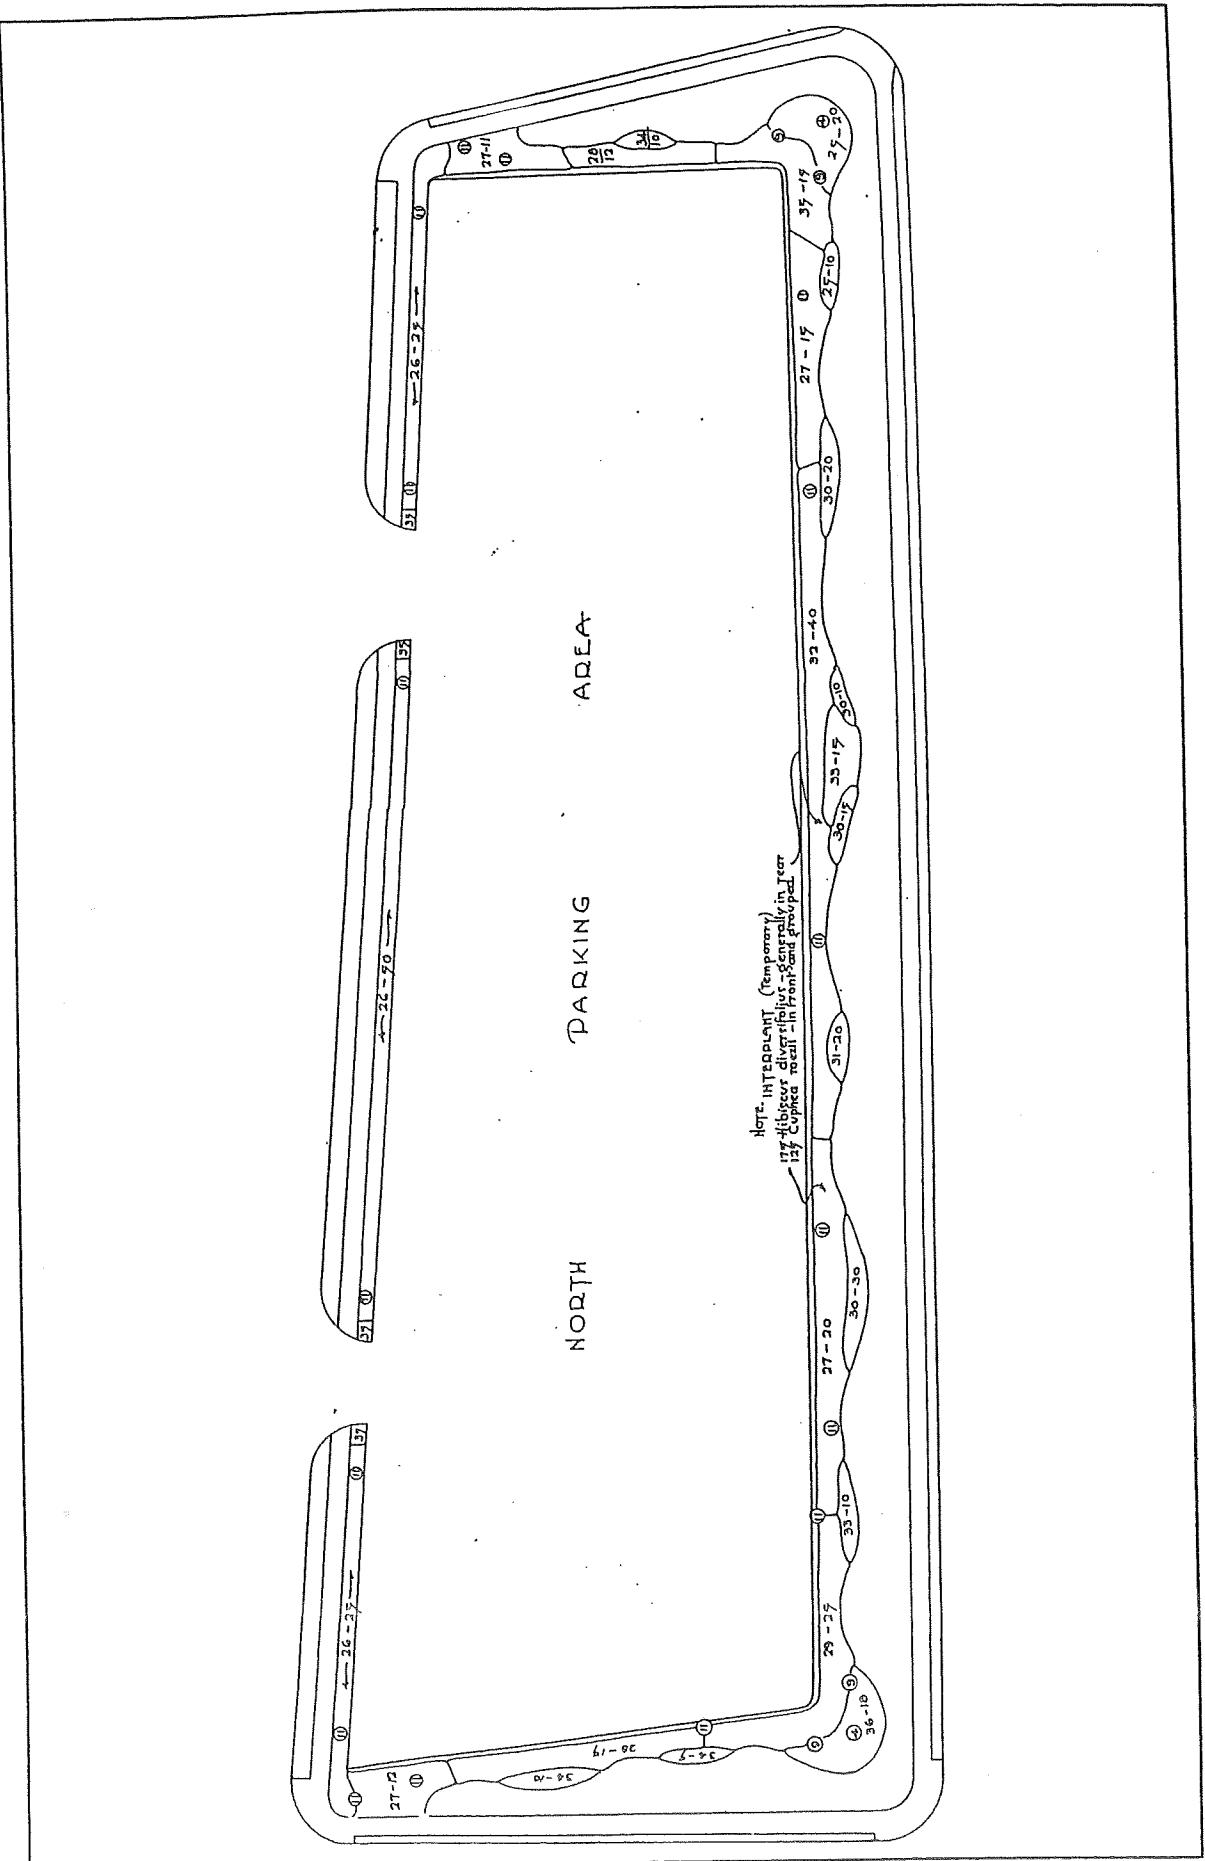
Original Roland Hoyt Landscape Plan – 1939 – West Side
